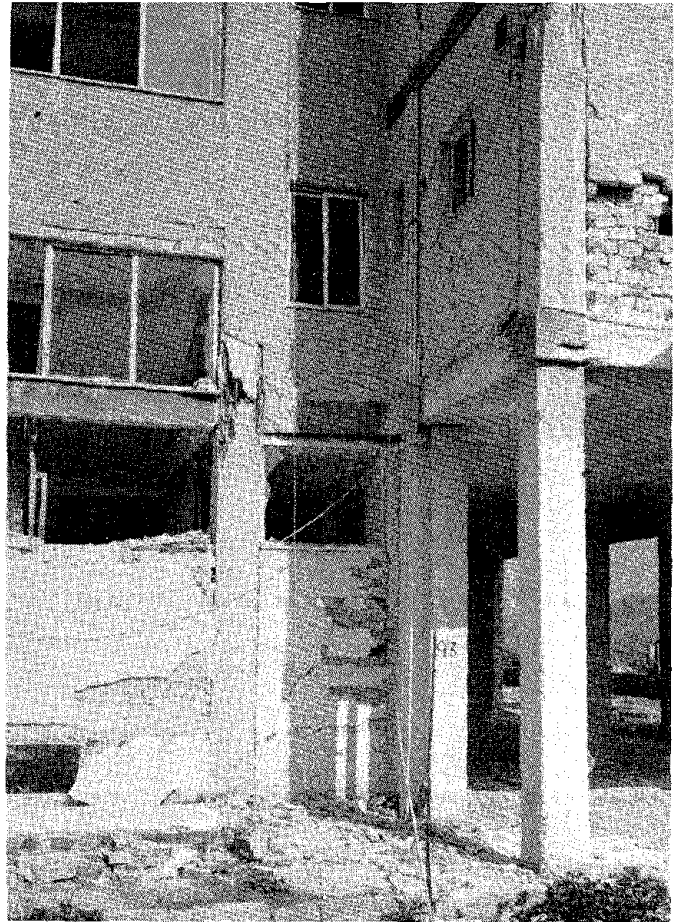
Conduits for electric cables pass through the column just inside the reinforcing bars and along the brick walls through channels chipped into the column and walls.
